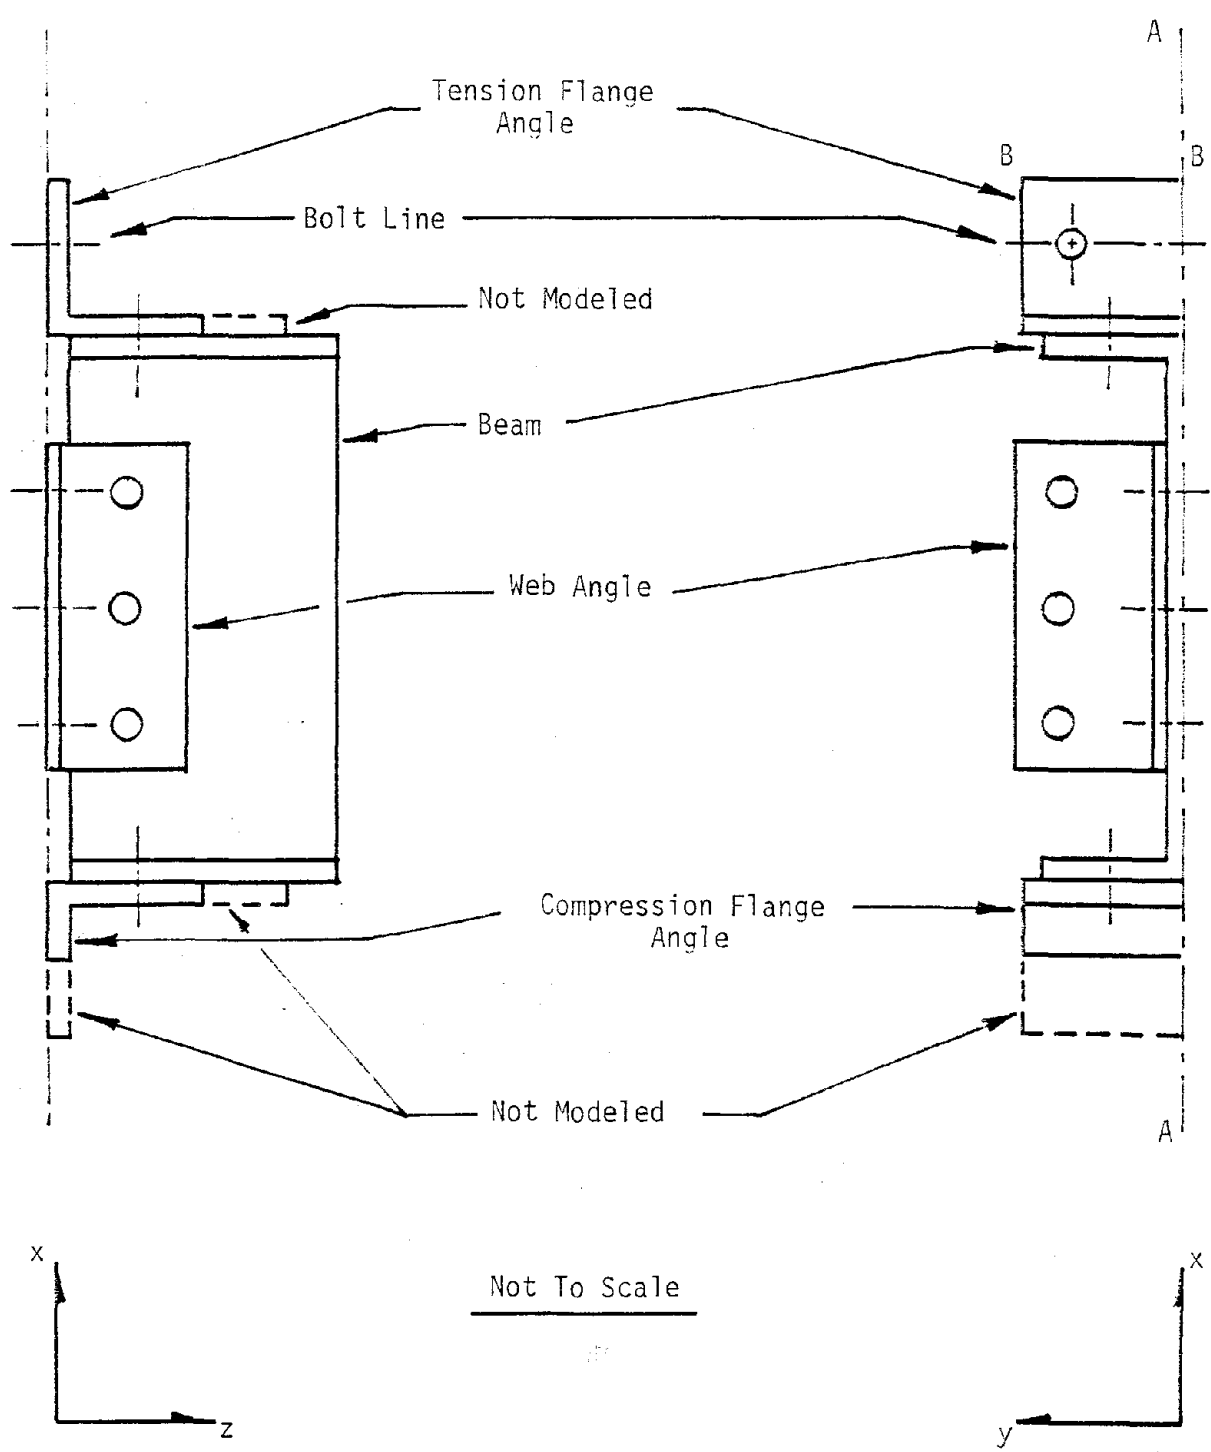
HALF MODEL OF BEAM TO COLUMN CONNECTION MODEL VI
